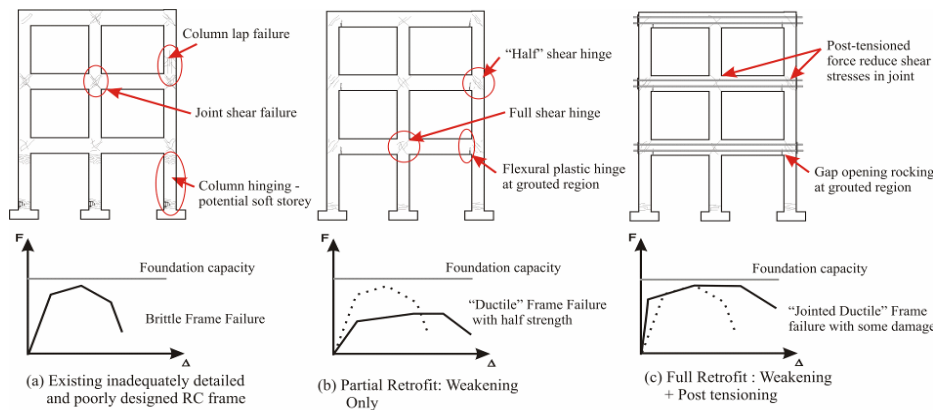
SW retrofit for rc frame: a) existing rc frame b) cutting the bottom longitudinal bars to reduce joint shear stress c) post-tensioning joint and weakened beam-column interface
